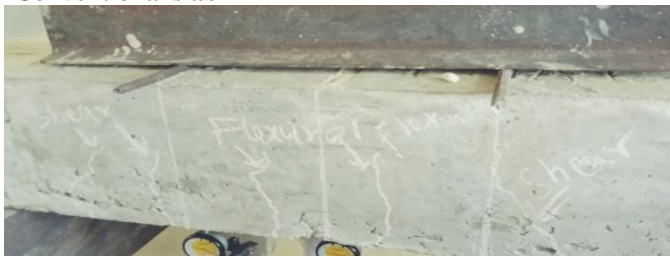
CRACKS ON CONVENTIONAL SLAB
